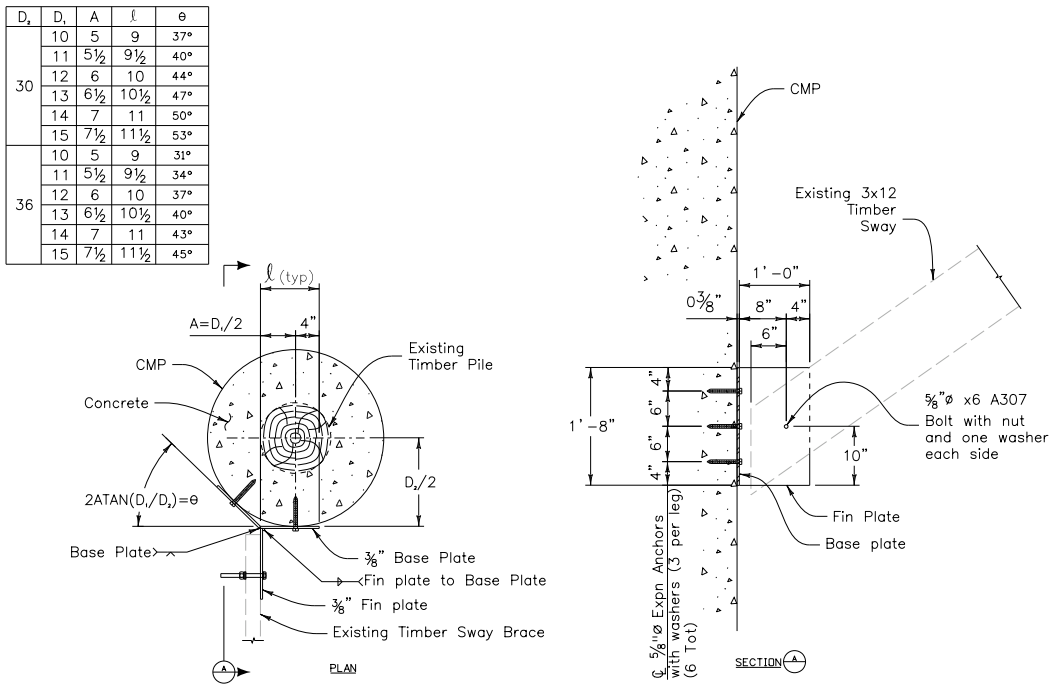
(G)-3 Sample Detail of Timber Pile Repair and Bracing
